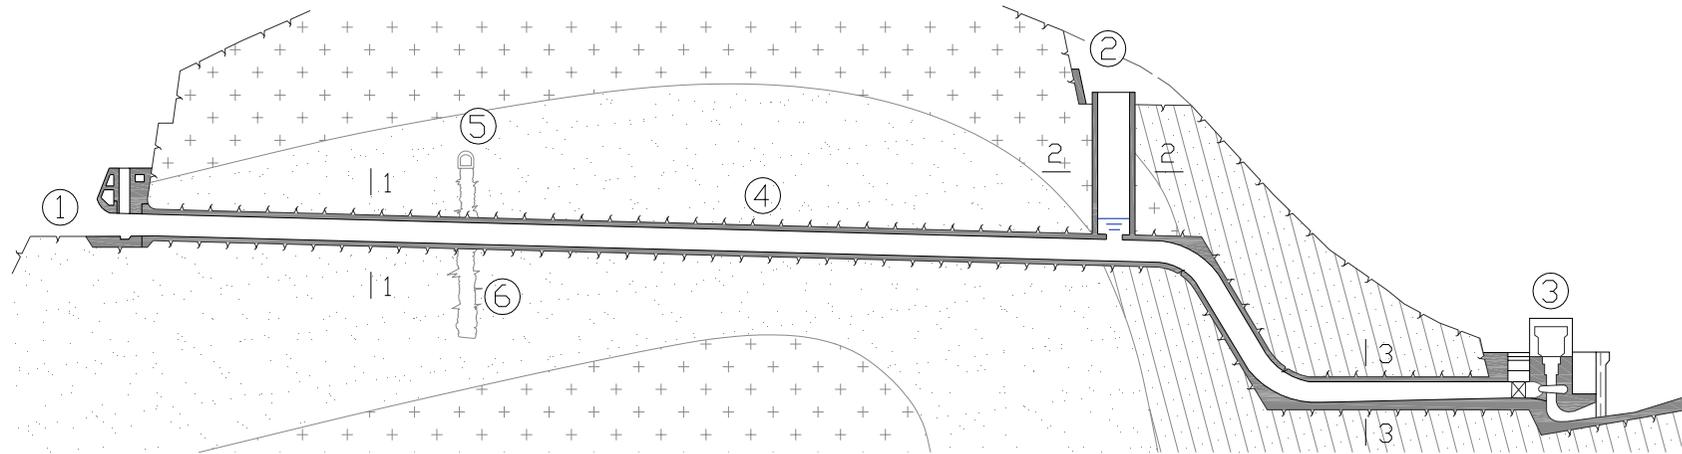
Longitudinal profile of power waterway. ①: power waterway intake, ②: surge chamber, ③: power house, ④: pressure tunnel, ⑤: access gallery, ⑥: grout curtain.
